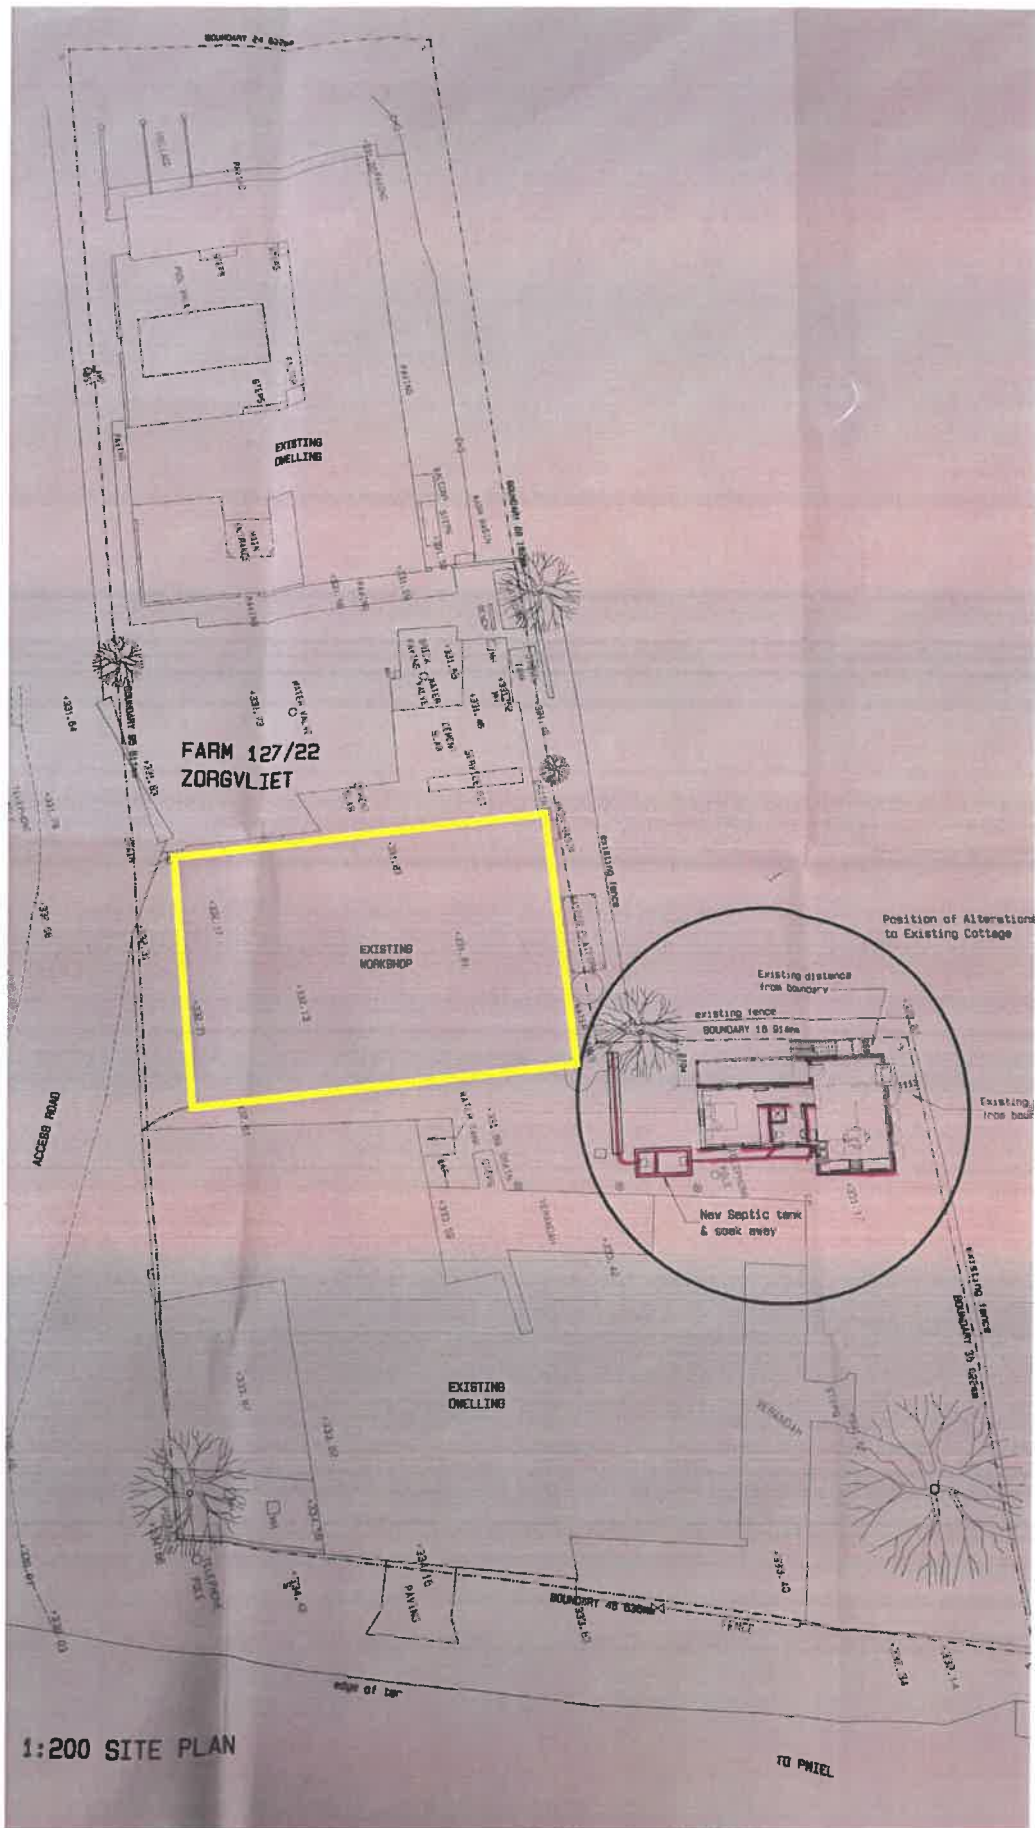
Position of Existing Workshop on approved building plan, L/03/0004
